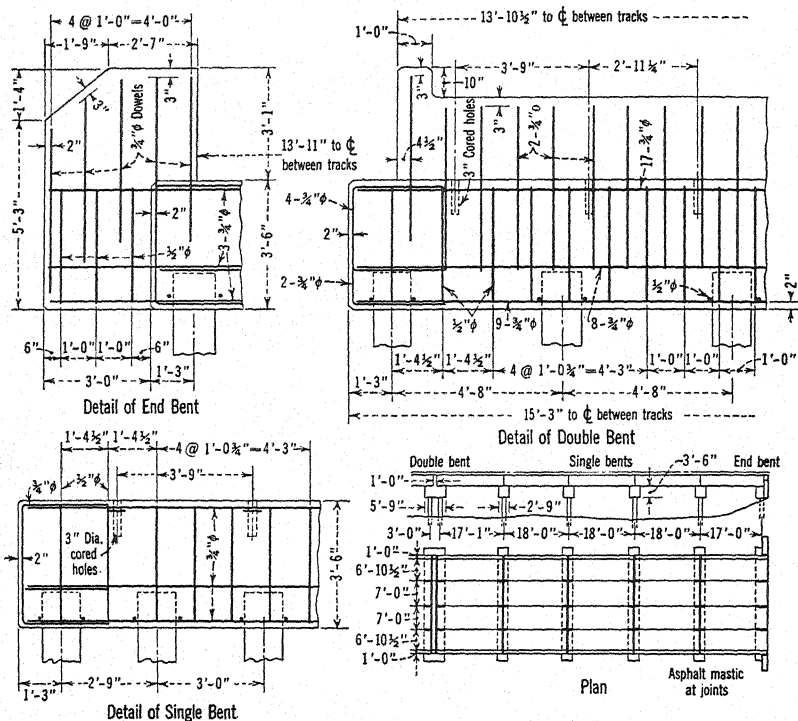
Typical Concrete Trestle. Baltimore and Ohio Railroad. (See p. 431.)
